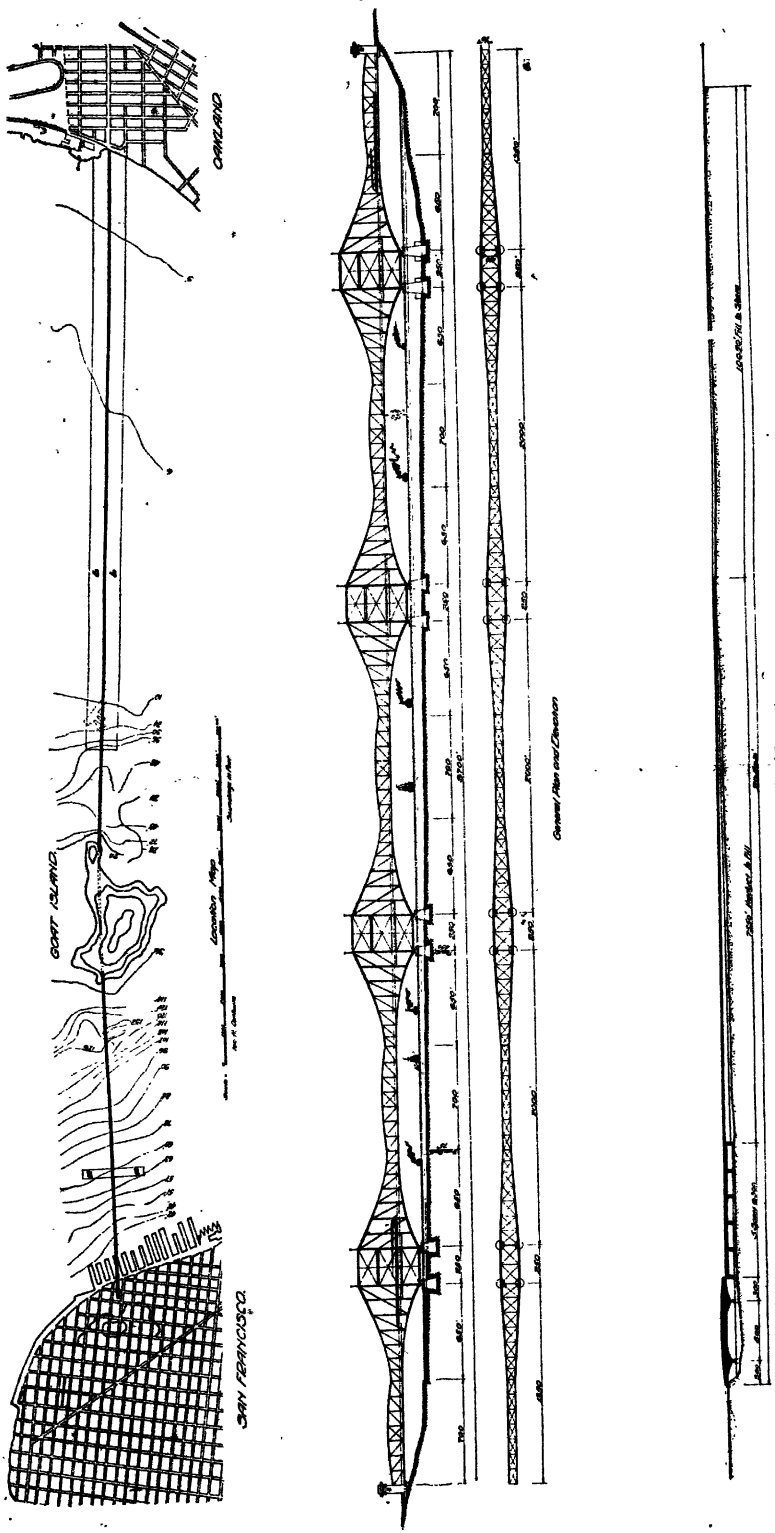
e. Proposed Layout for a Cantilever Bridge over San Francisco Bay.
